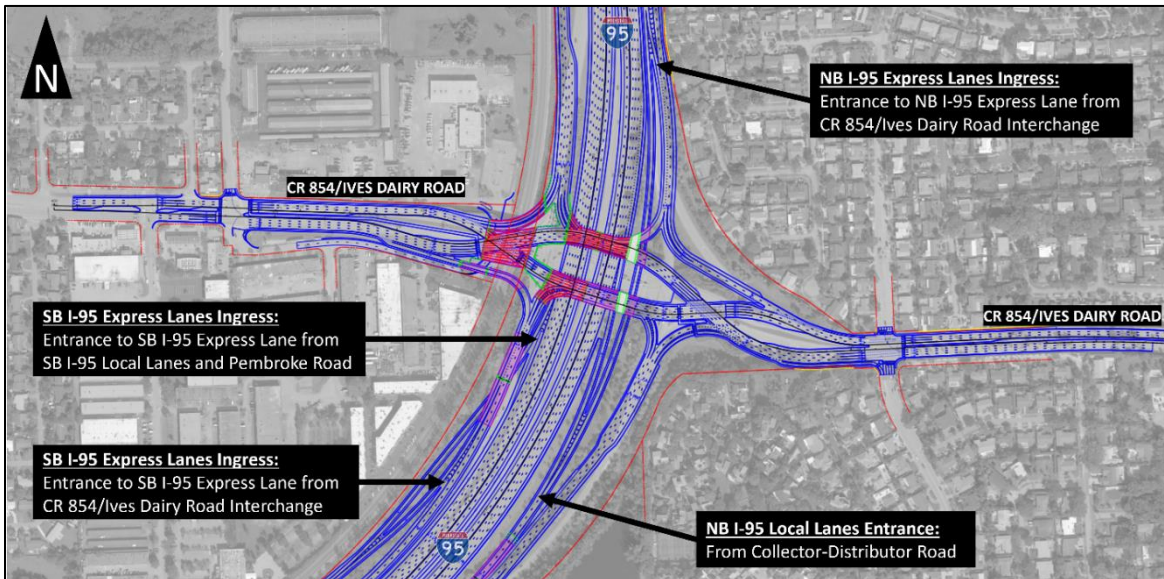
14: Proposed Configuration - Alternative 3 – CR 854/Ives Dairy Road
